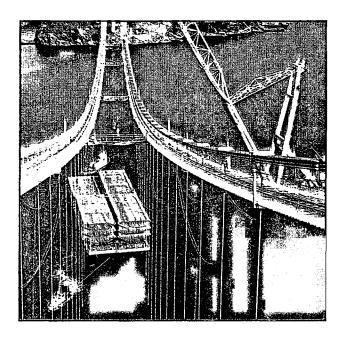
SHIPPING OF THE GIRDER SEGMENTS
